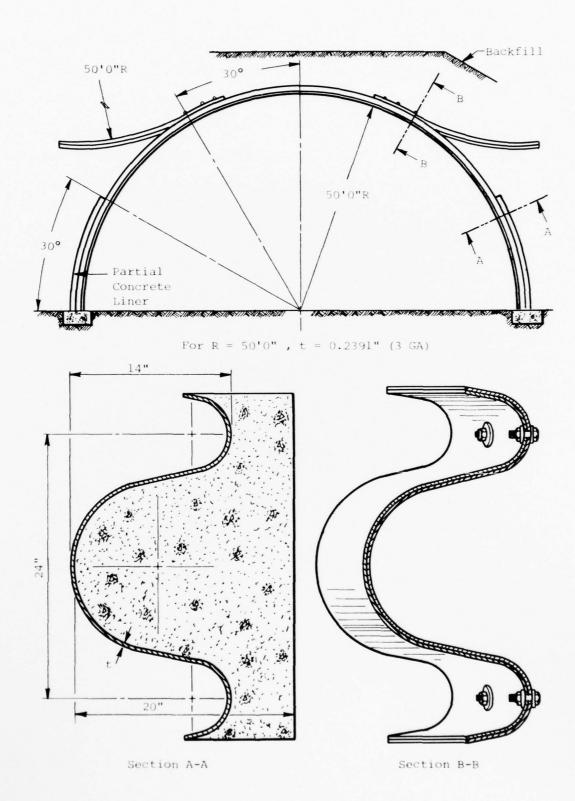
Aircraft Shelter Arch - 100-Foot Span
